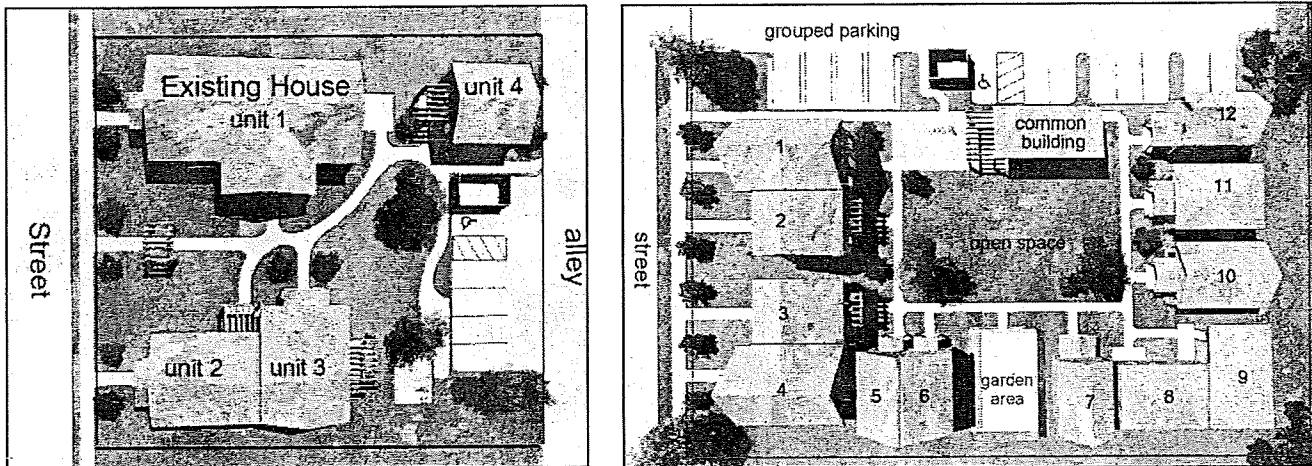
Cottage Housing Conceptual Site Plans
